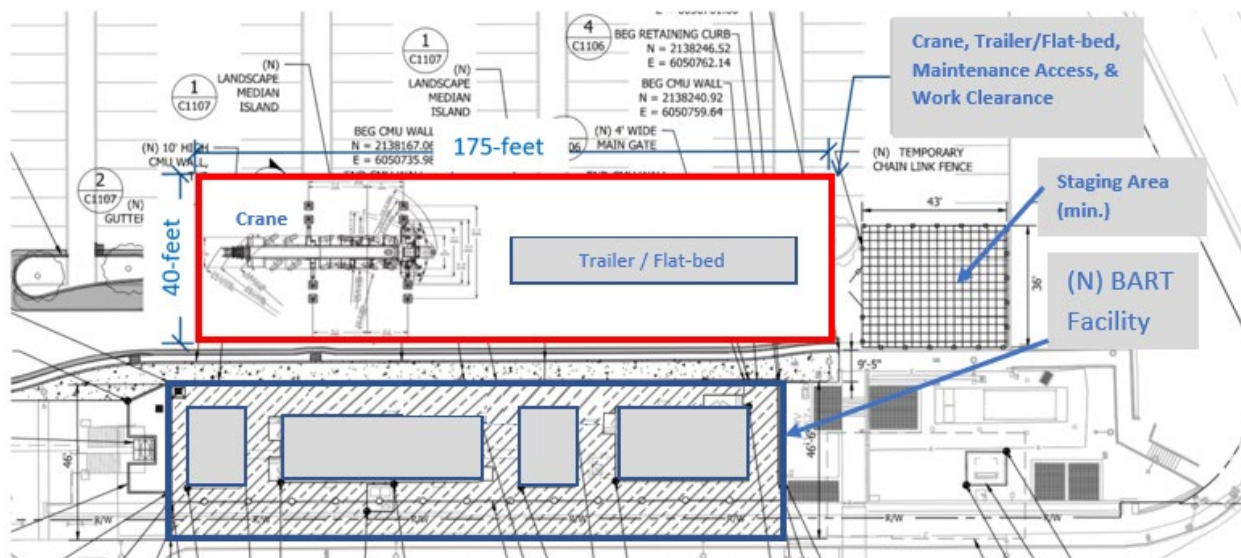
Typical layout of Crane and Trailer at High Voltage (HV) Substation
